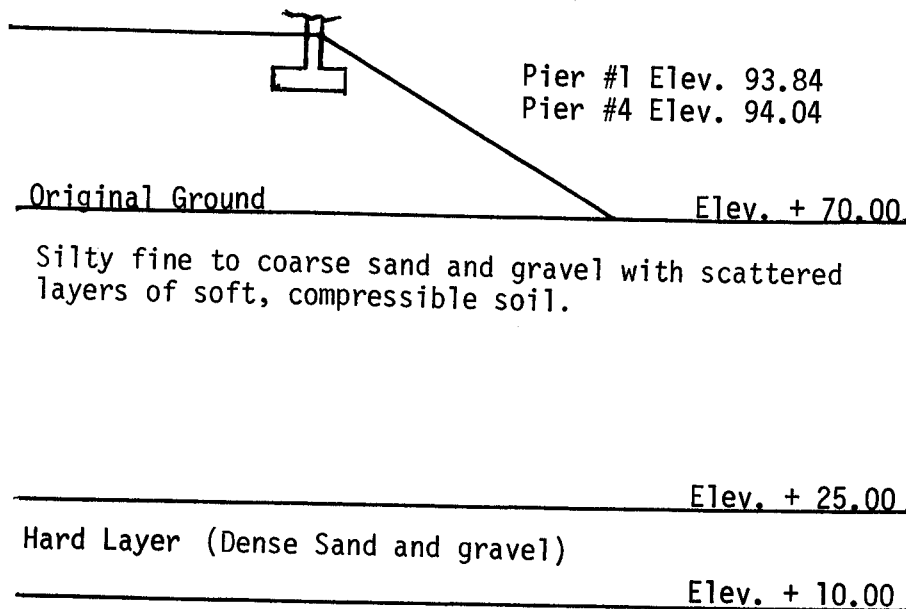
Profile of Ellingston Road Bridge Approach Embankment
